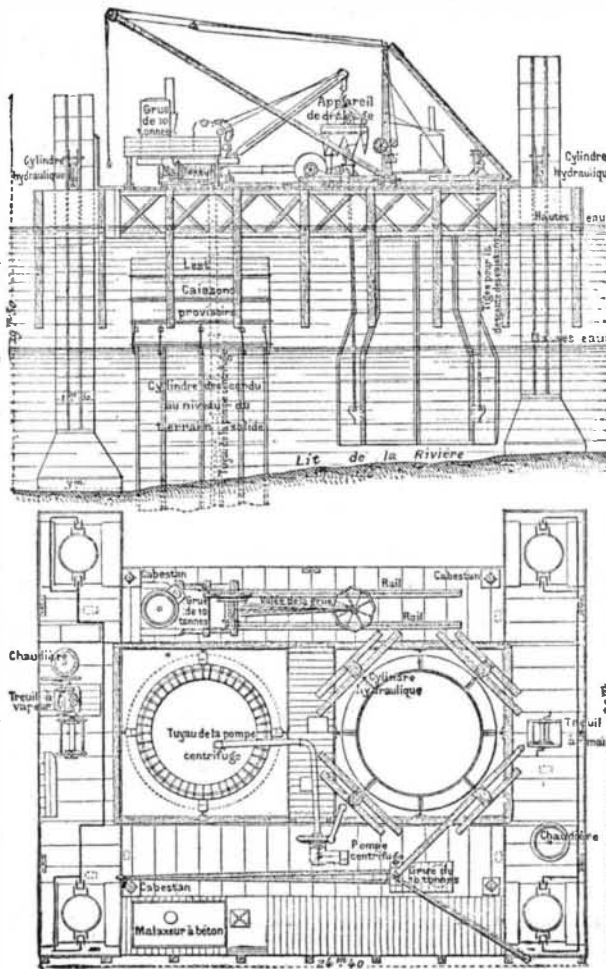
ELEVATION AND PLAN, SHOWING CAISSONS SUPPORTING COLUMNS AND MOVABLE PLATFORM.
